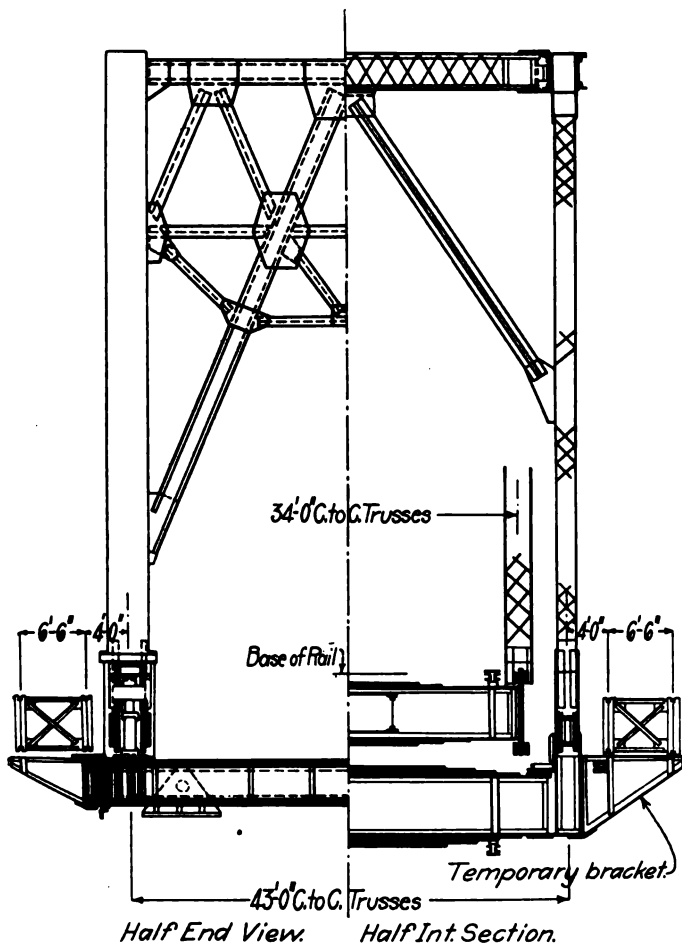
Elevation and Section Showing Relation of New Bridge to Old and the Temporary Material Tracks Outside of Trusses.
